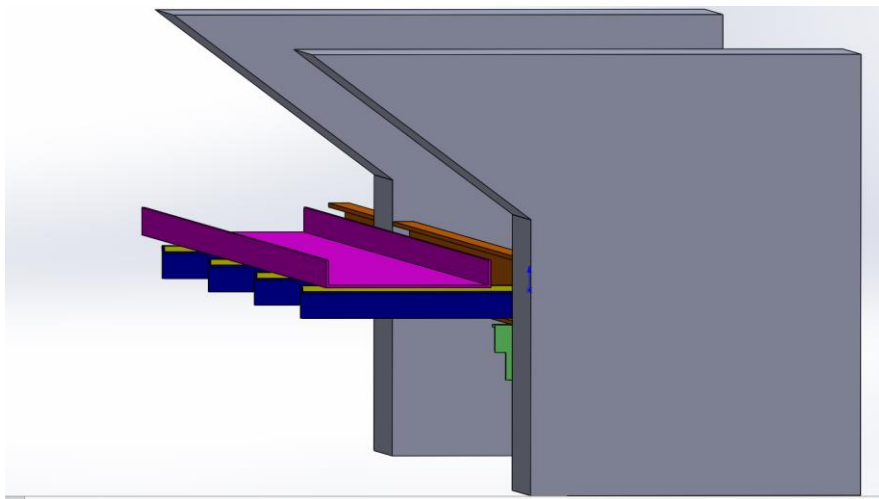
Installation of cable tray fashion on cable route 'H' to 'I'
